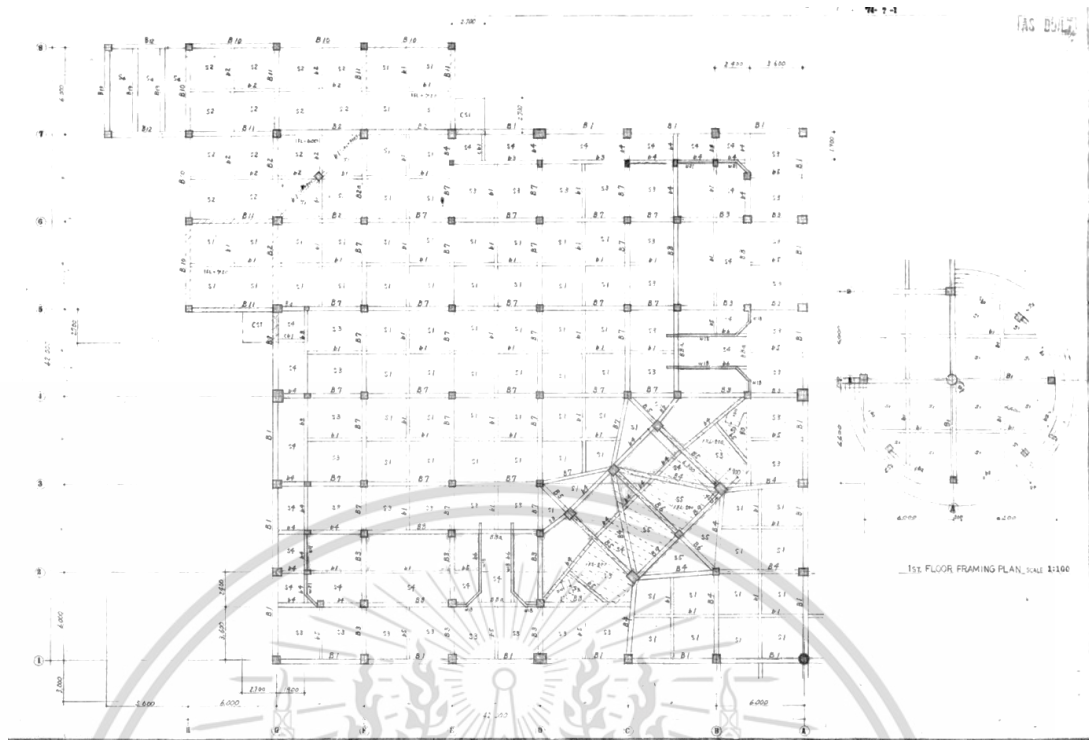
Original drawing of First floor framing Lay-out plan of First auditorium complex
